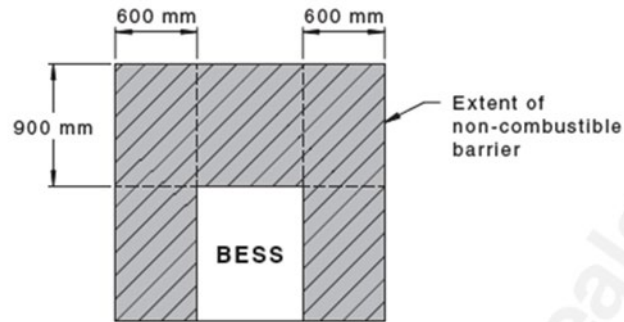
Barrier zones for pre-assembled integrated BESS installed on or near a habitable room-facing wall
